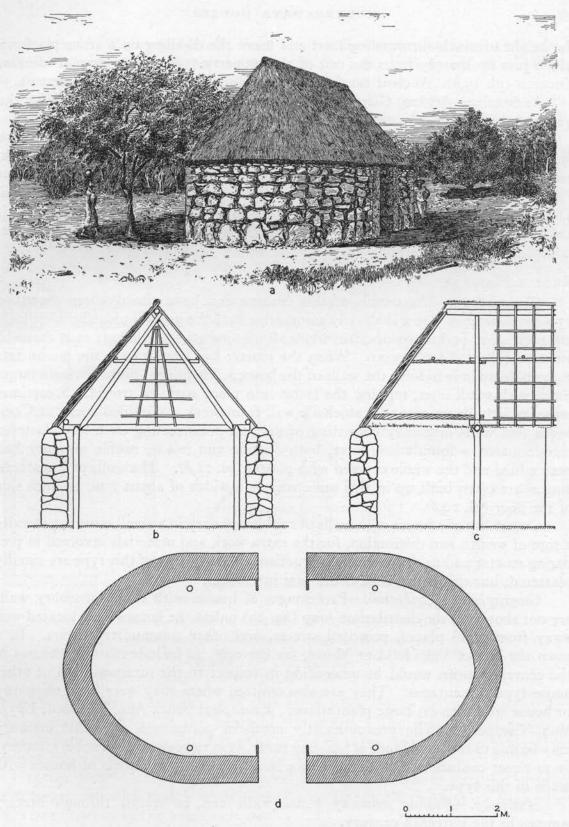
HOUSE 5, TELCHAC PUEBLO, YUCATAN (Apsidal plan, dry rubble masonry walls, grass thatch) a: Perspective. b,c: Elevations. d: Plan.
